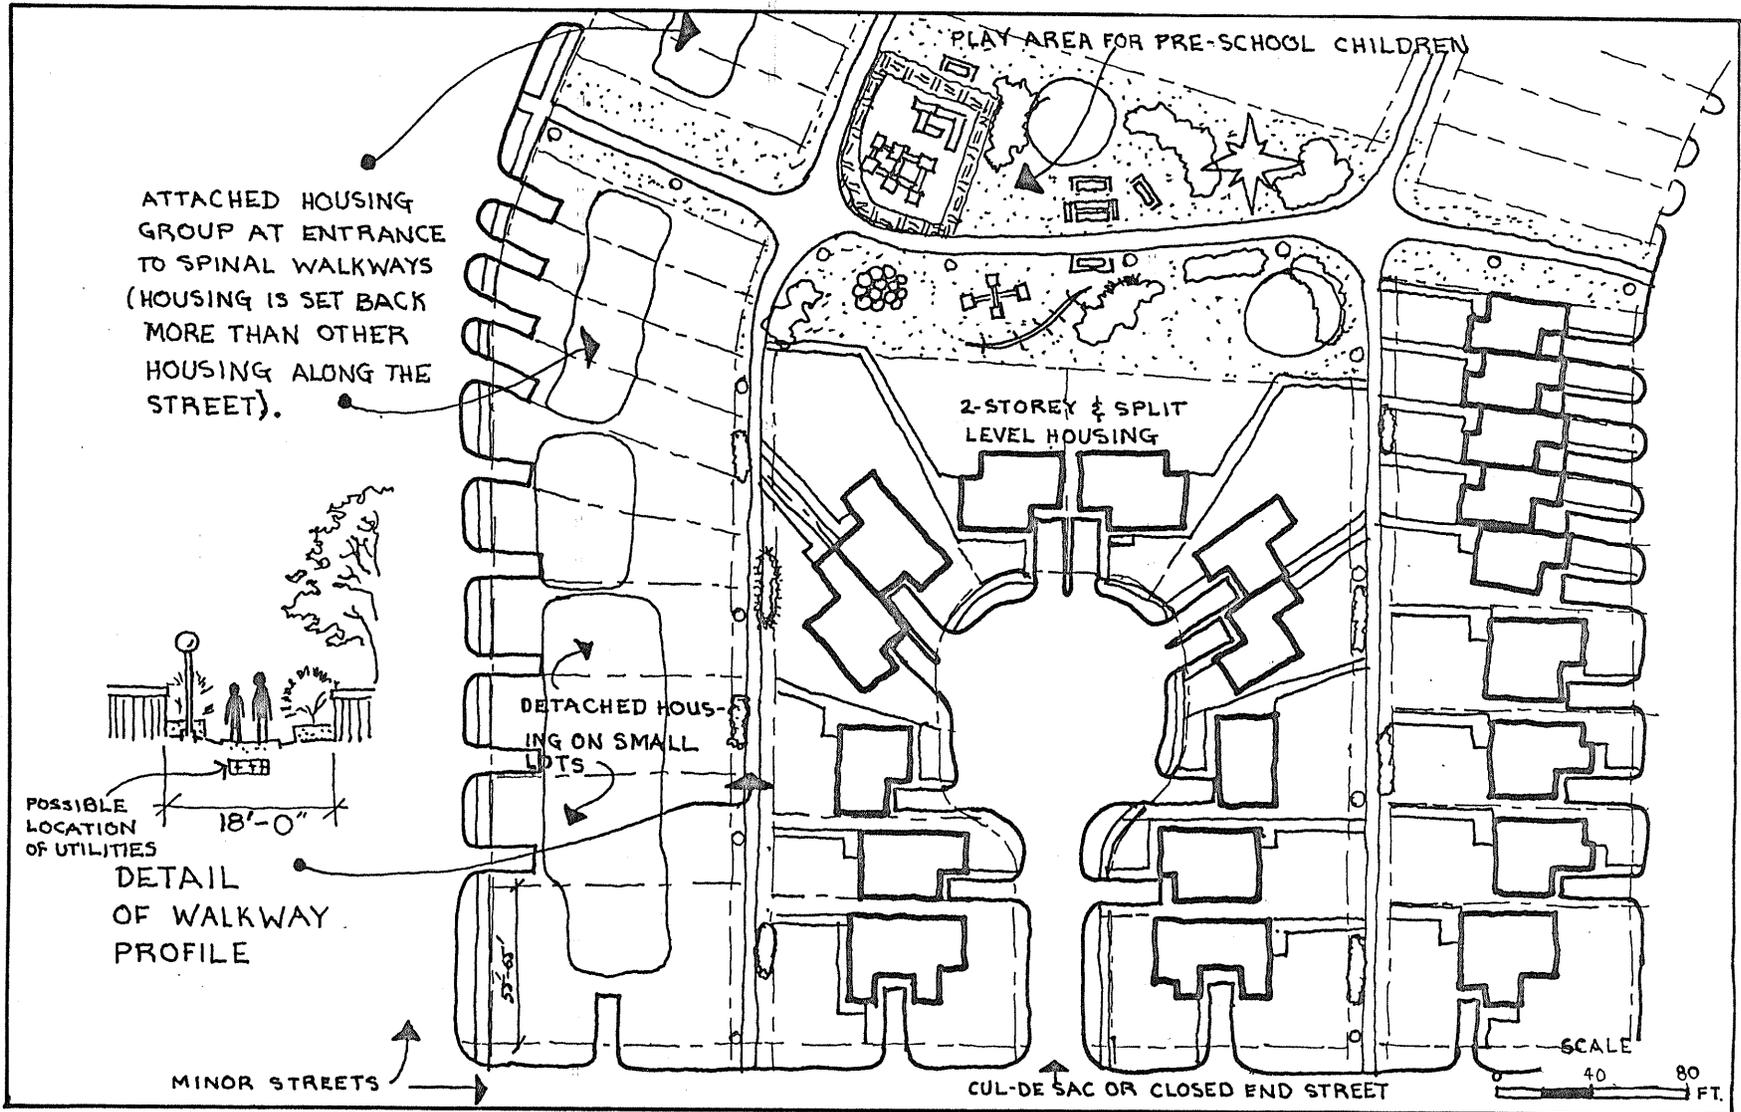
A Detail of the Prototype Relationship of Housing, Walkways, and Streets
